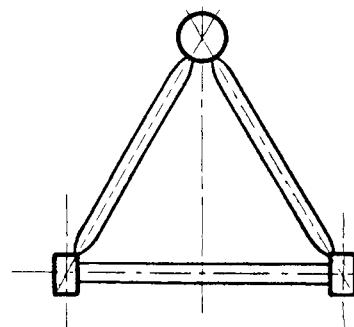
Triangulated girder (two RHS bottom and one CHS upper chord)
